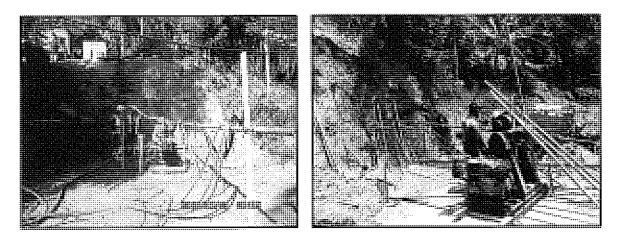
Drilling of first holeFig 23: Drilling of 05th holeConducting horizontal drilling using percussion and rotary drilling machines.
